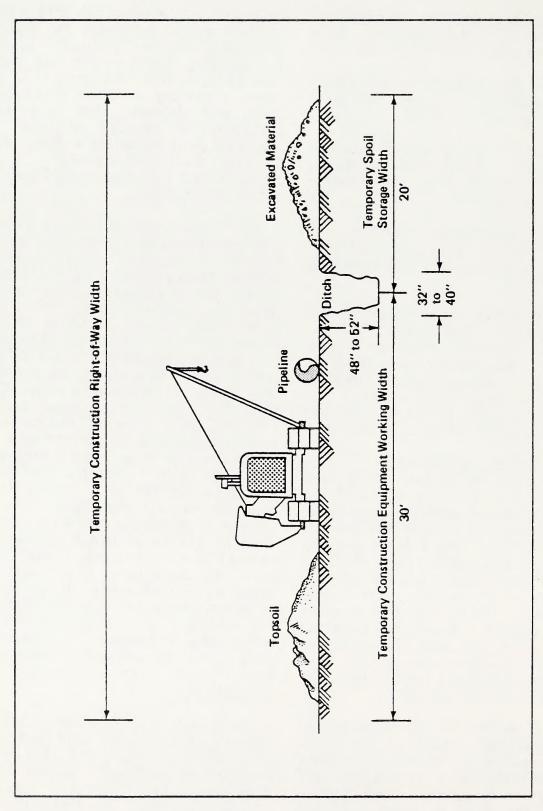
CONSTRUCTION RIGHT-OF-WAY CROSS SECTION
